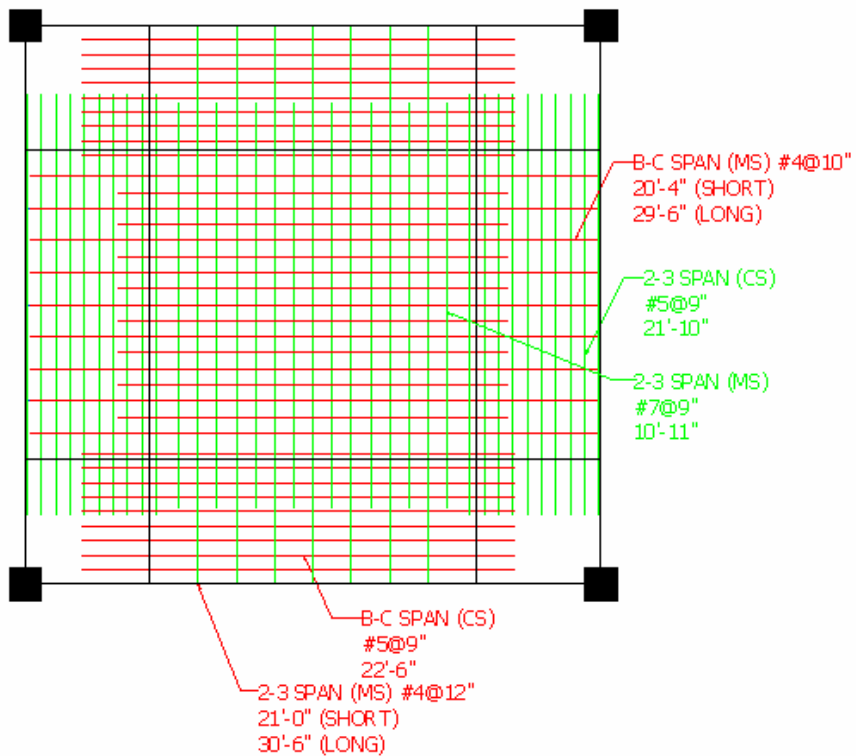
B. Positive Reinforcement Layouts in Bay bounded by Column Lines B and C, 2 and 3
